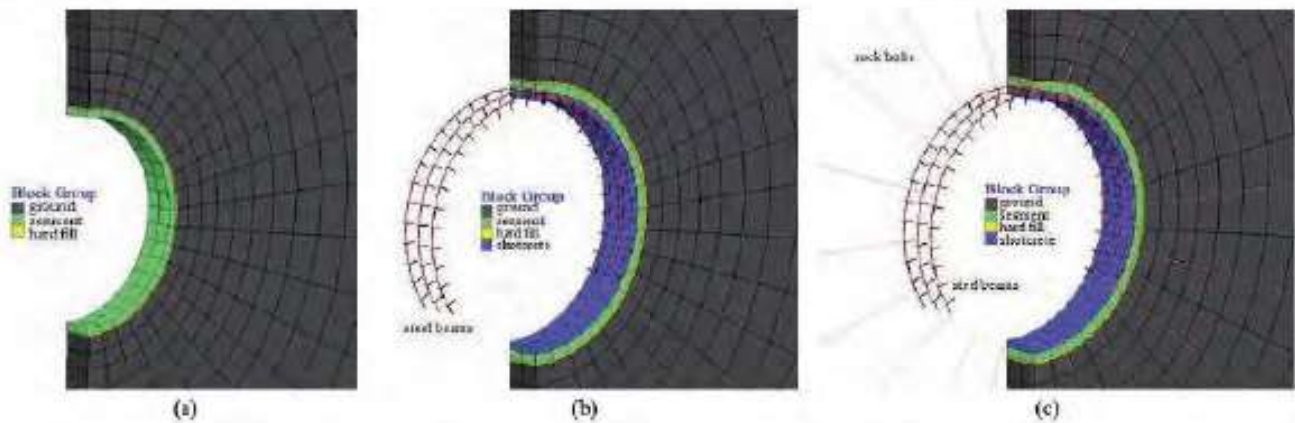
Sectional view of T26 excavation a) Original excavation with normal ground support including segmental lining b) Excavation with installation of steel beams, wire mesh and shotcrete on top of the standard lining c) Excavation with addition of long rock bolts besides all the previous support types (selected section between 28 and 30th m of tunnel excavation)
